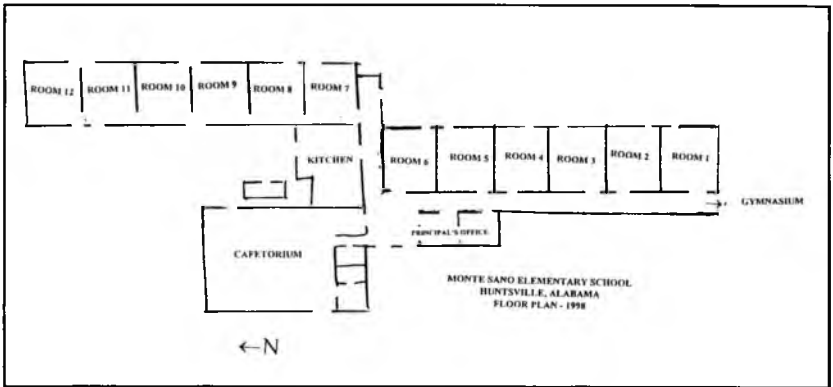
Floor plan of center hall design of Monte Sano Elementary School.
